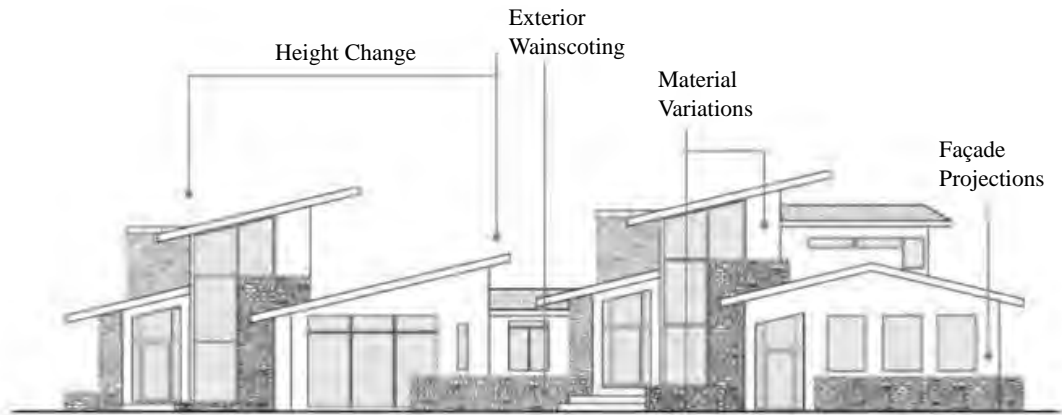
BUILDING MATERIALS AT WALL EDGES
